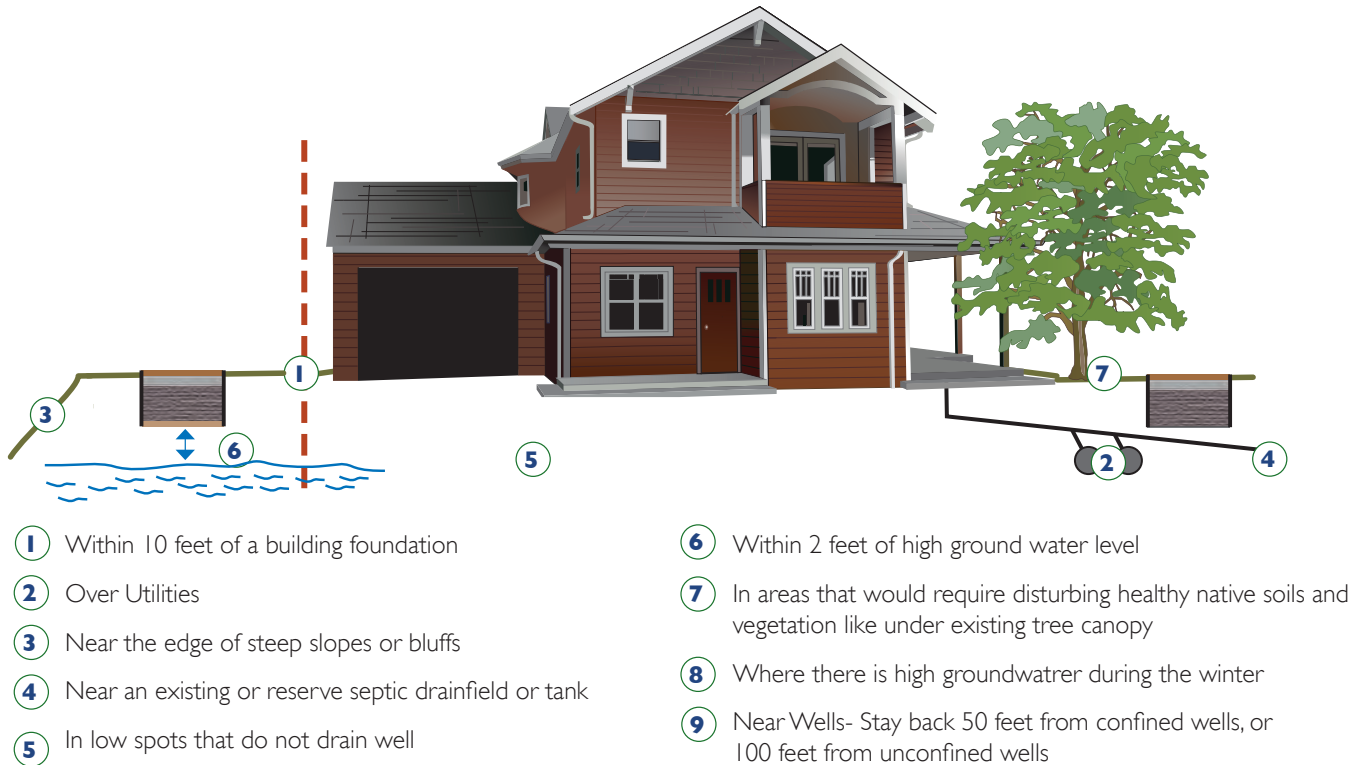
Examples of site constraints for locating an Infiltration Practice
